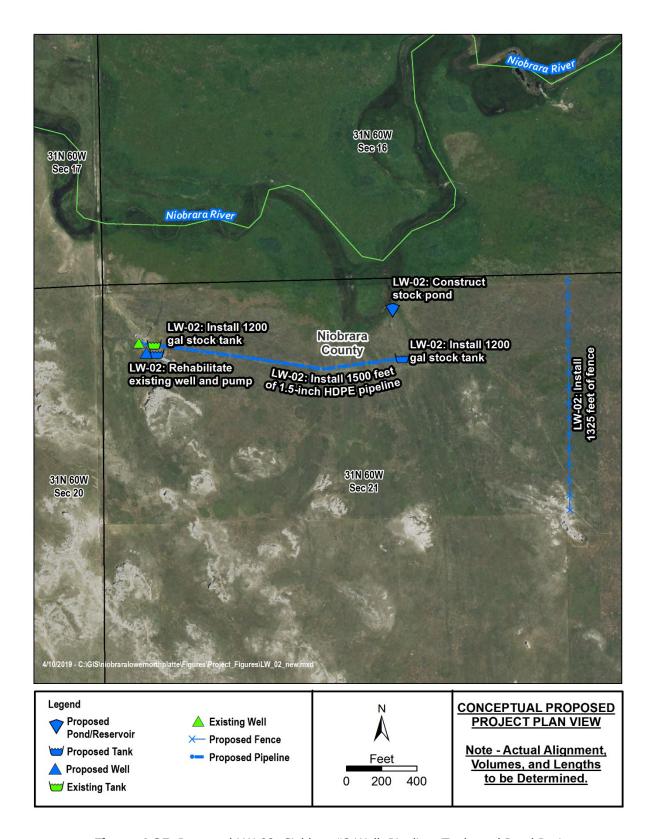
Proposed LW-02: Siebken #3 Well, Pipeline, Tank, and Pond Project.
